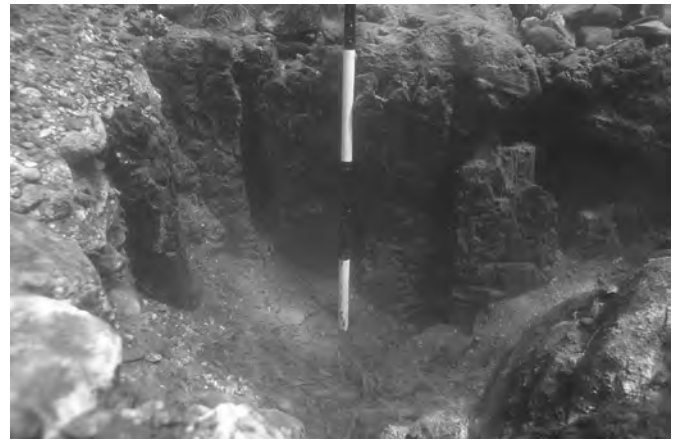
Vertical planked formwork around the concrete dock at Santa Severa (A. M. McCann; used with permission).
